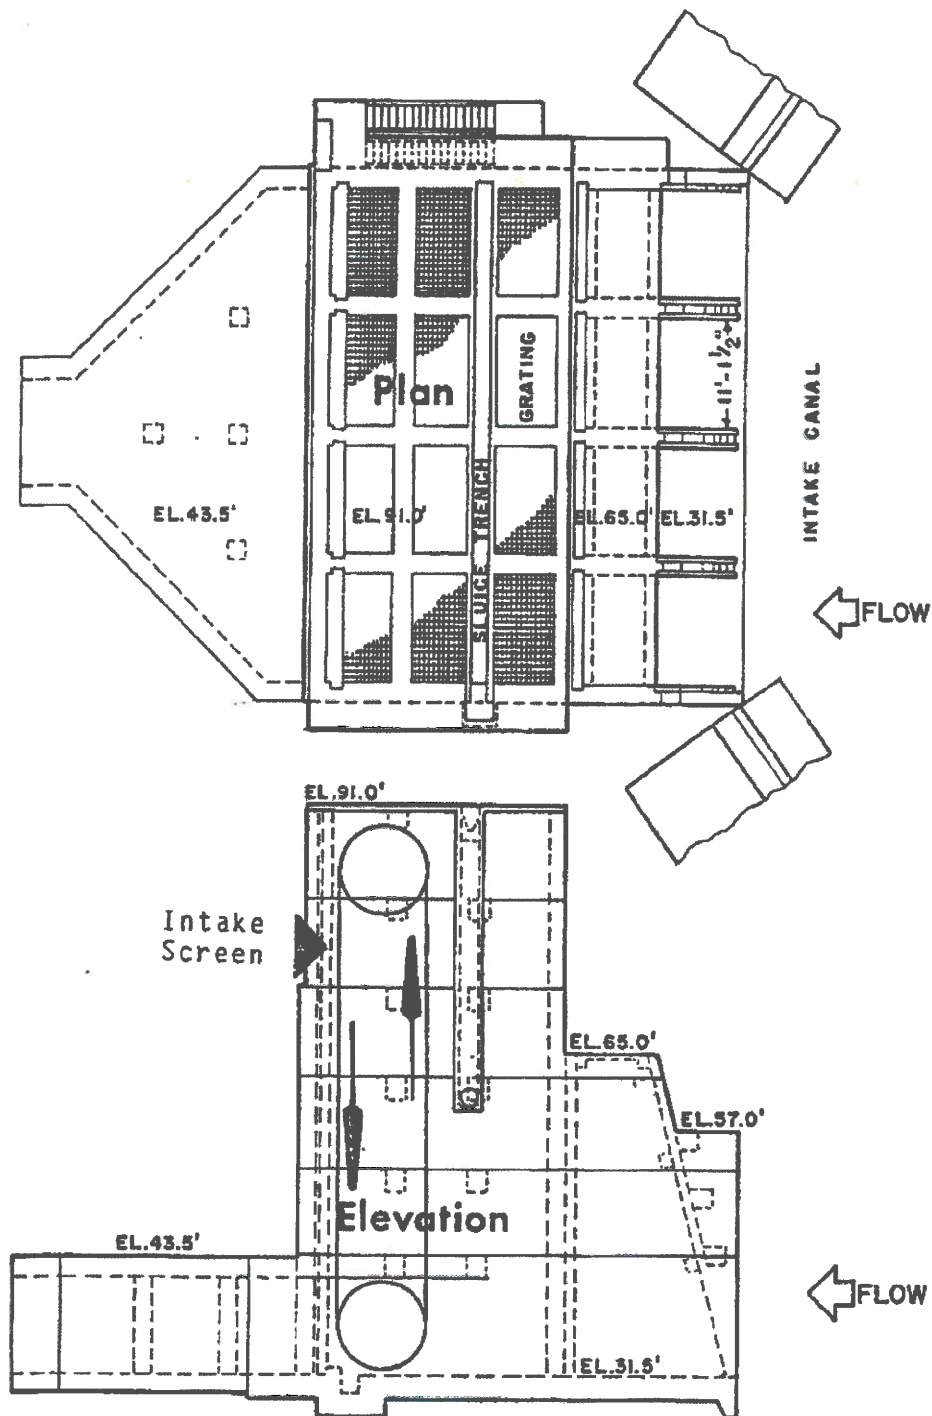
Cooling Water Intake Structure Side-View at Plant Scholz.
